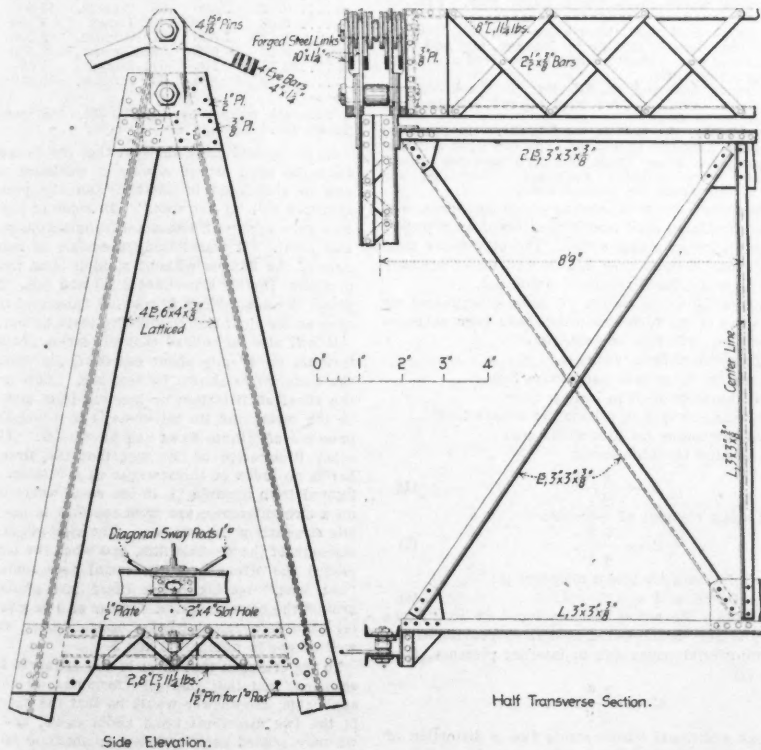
CENTER TOWER CONSTRUCTION FOR GRAND TRUNK RY. BRIDGE OVER THE TRENT VALLEY CANAL.
